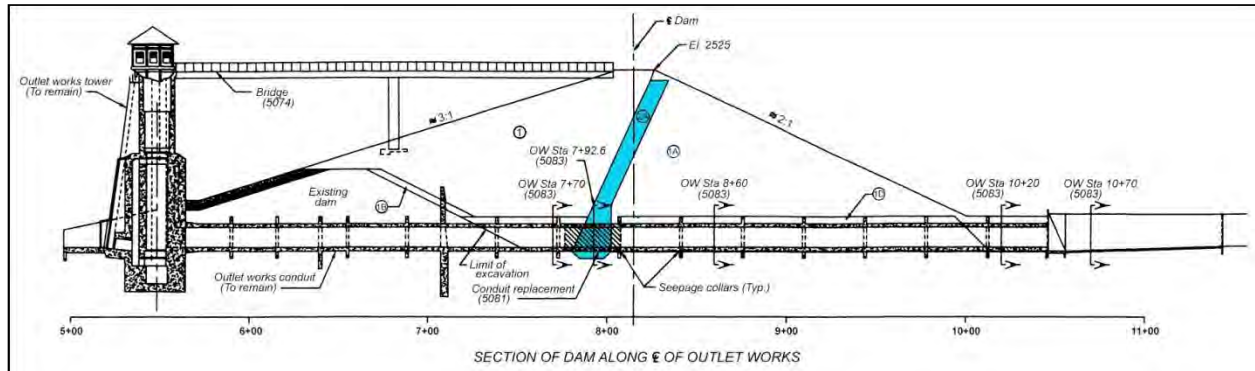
Typical filter addition around a conduit near the centerline of a dam enlargement.
